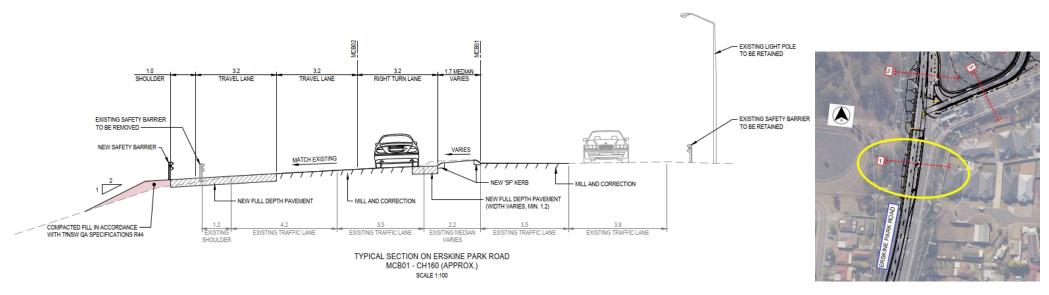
Typical cross section (looking north) on Erskine Park Road including the dedicated right turn lane onto the proposed on-ramp
